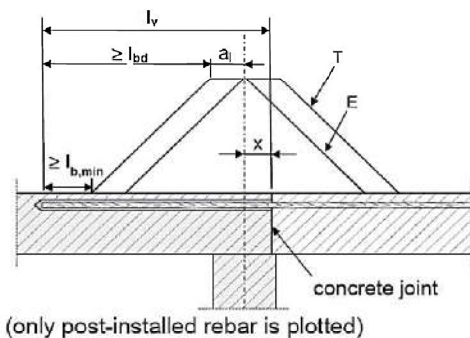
Anchoring of reinforcement to cover the line of acting tensile force.
